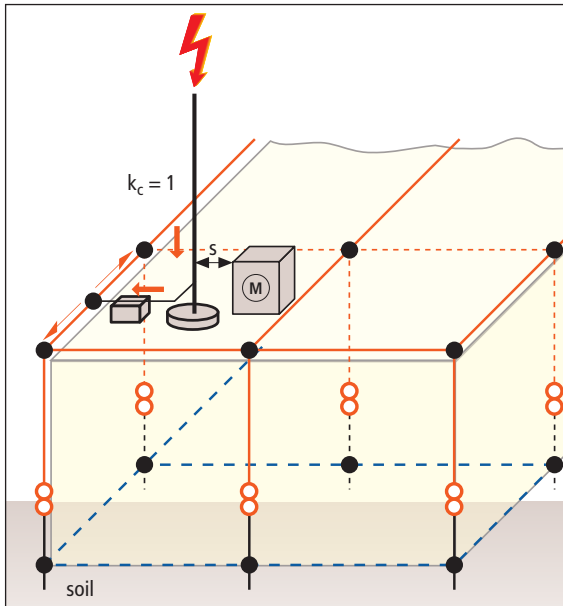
Flat roof with air-termination rod and ventilation outlet
